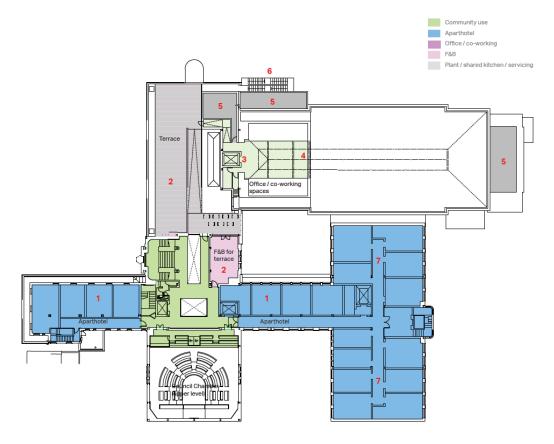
Town Hall – Proposed Second Floor (Source Applicant)
